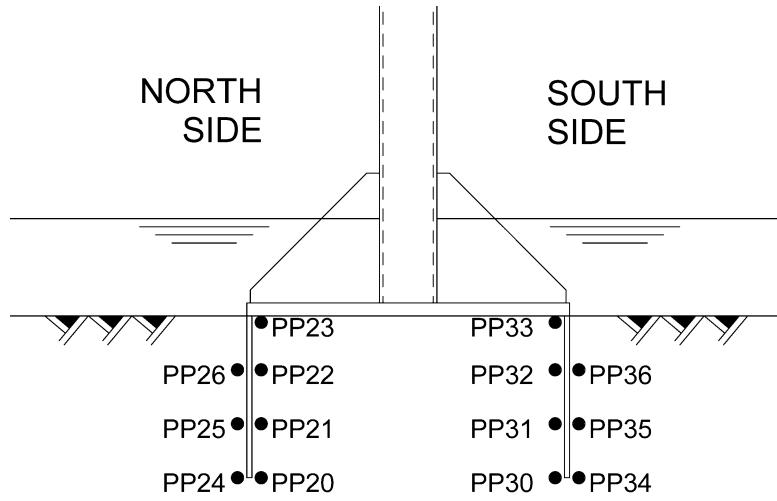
Layout of pore pressure transducers (PP#) around the front and back sides of the bucket foundation
